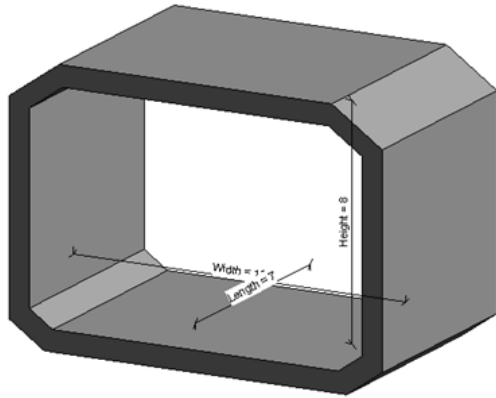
Rectangular Tunnel (Box Tunnel)
